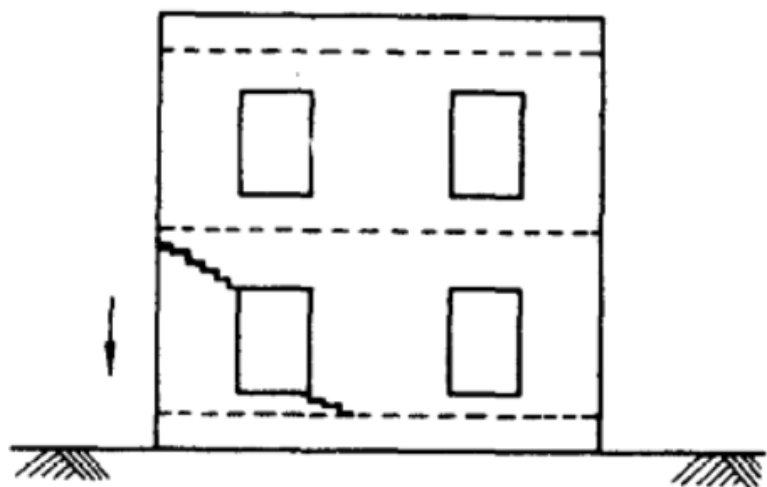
Cracks at the Corner of a Building Due to Foundation Settlement
